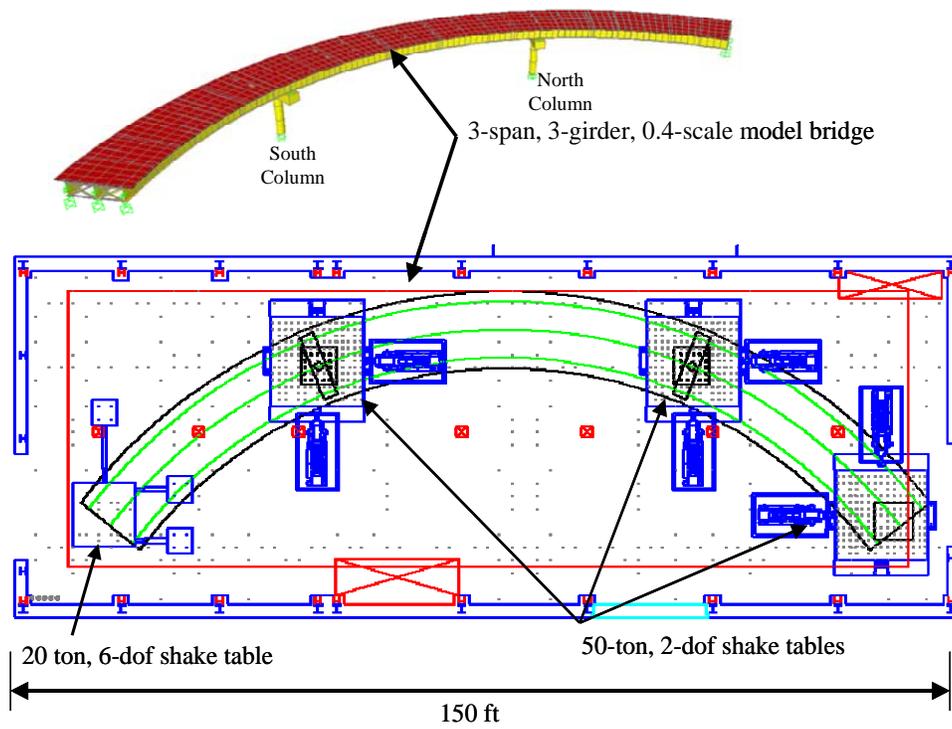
Bridge Model and Layout in Large-Scale Structures Laboratory.
